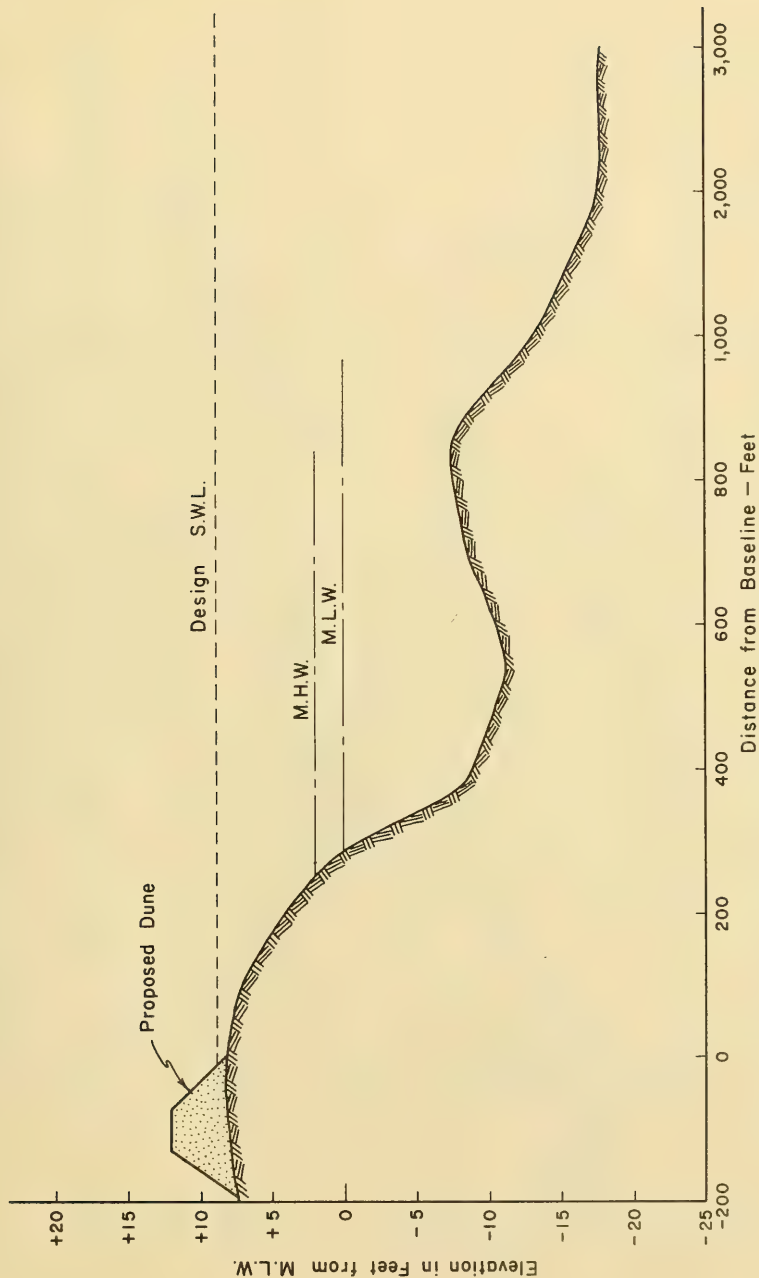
TYPICAL NEARSHORE PROFILE SHOWING THE DESIGN STILL WATER LEVEL AND PROPOSED DUNE SECTION
